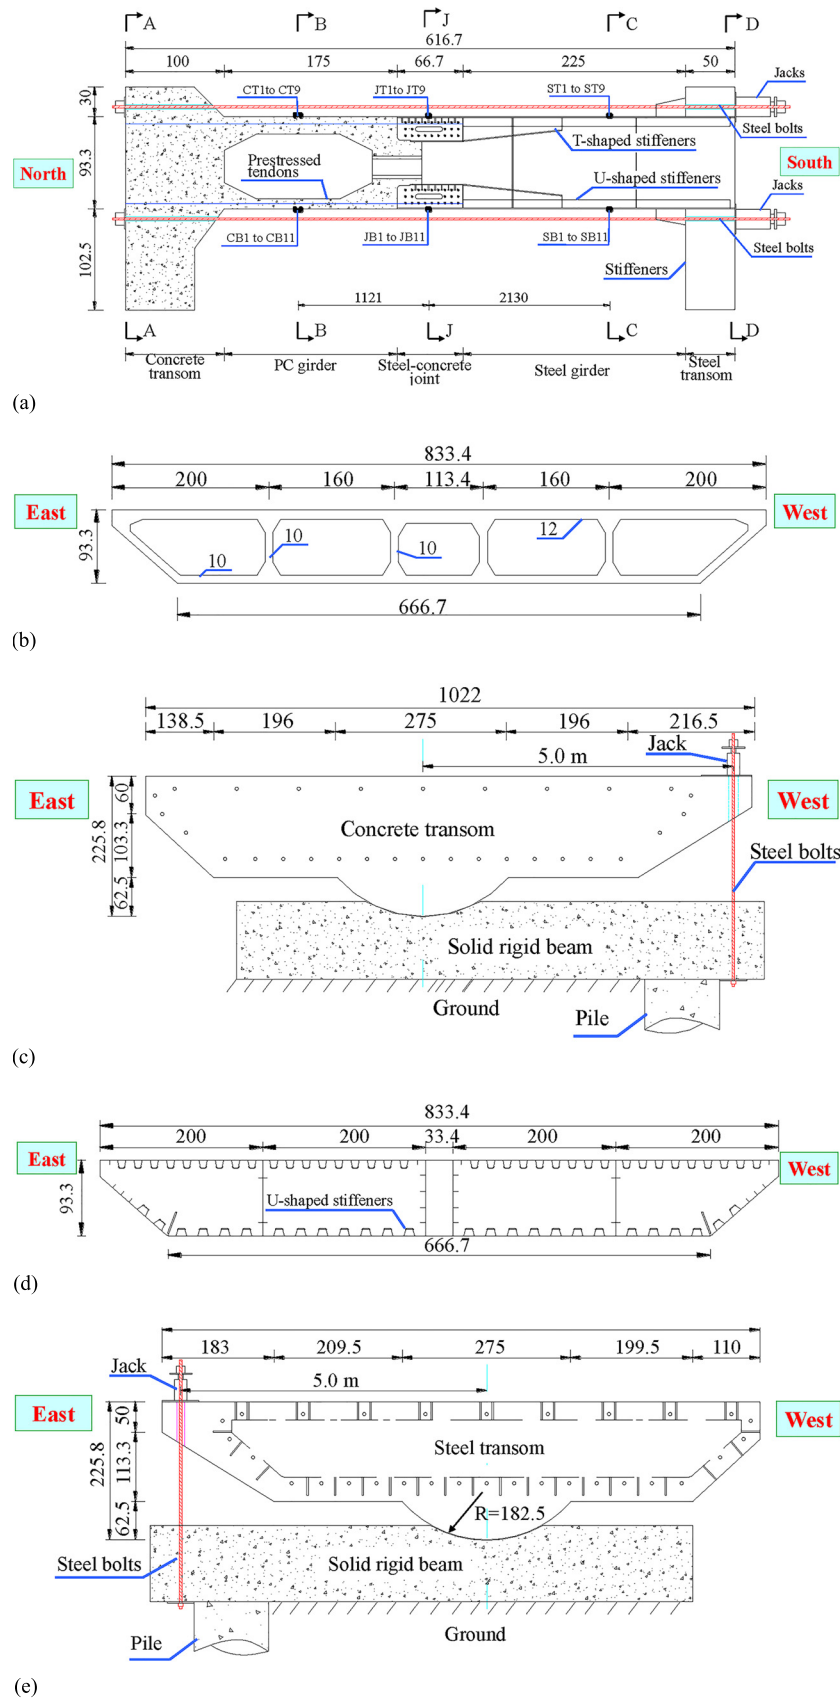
Outline of test model: (a) elevation view; (b) concrete transom section (A-A); (c) PC girder section (B-B); (d) steel girder section (C-C); and (e) steel transom section (D-D). (unit: cm).
